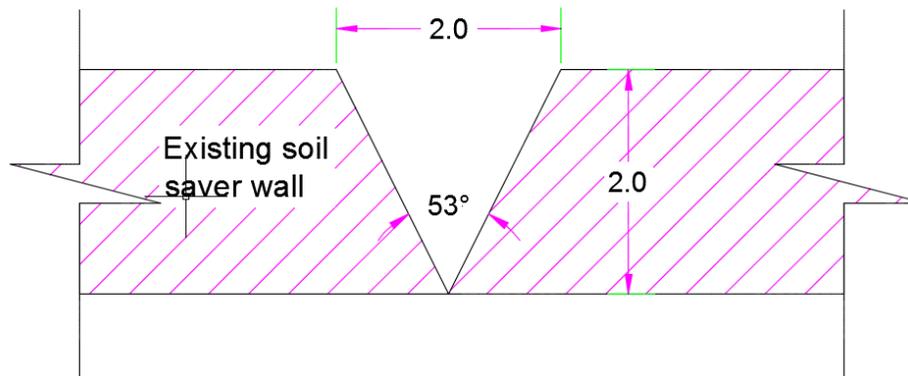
Schematic Front Elevation of V-Notch Soil Saver Wall
